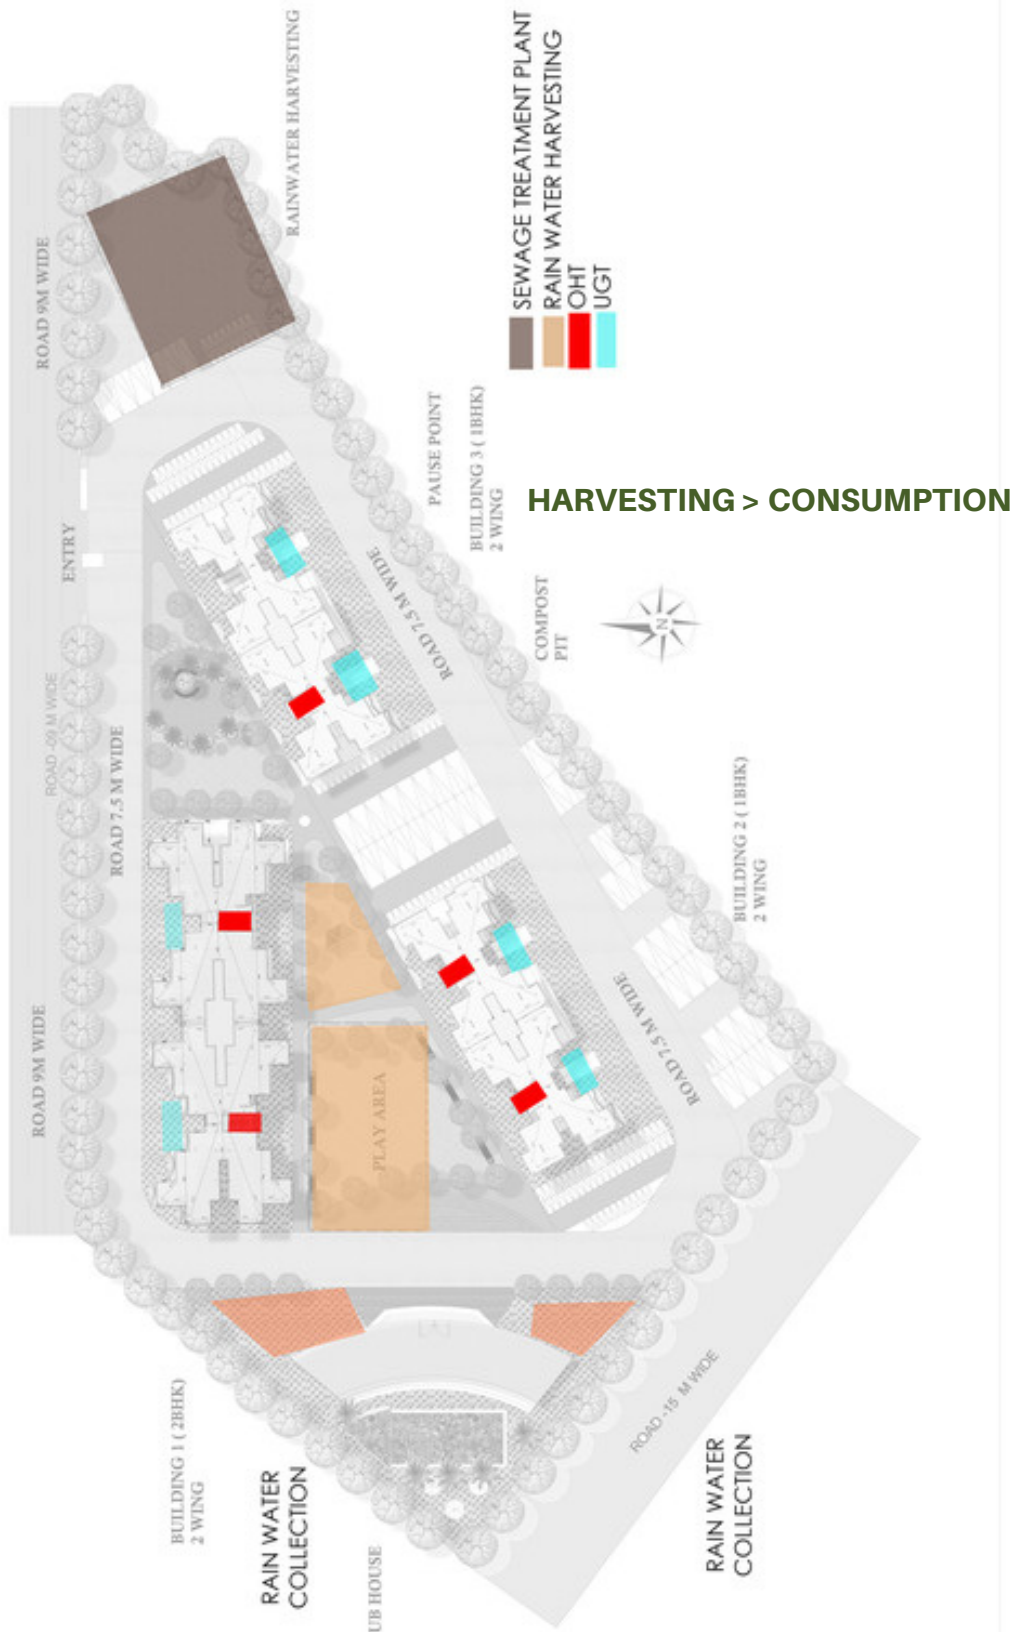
SITE PLAN SHOWING UTILITIES
